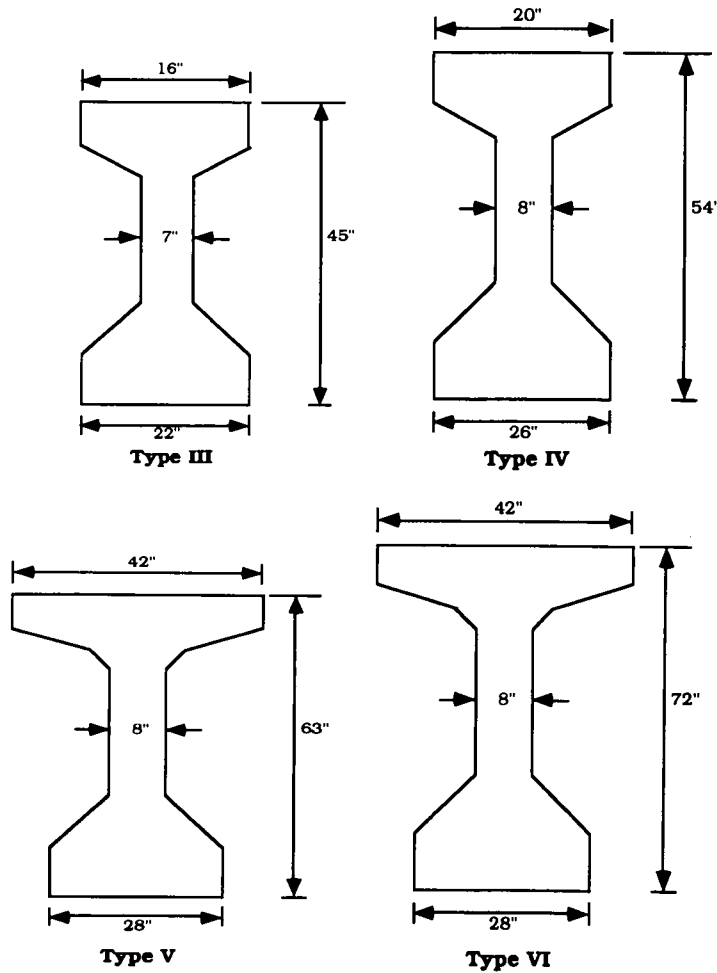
AASHTO girders Types III through VI. All dimensions are in inches (1 in. = 25 mm).
